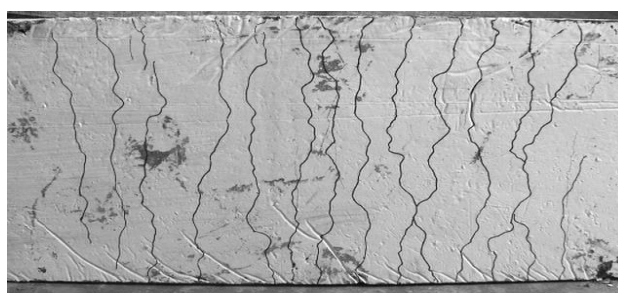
Crack pattern of grooved GFRP reinforced slab
